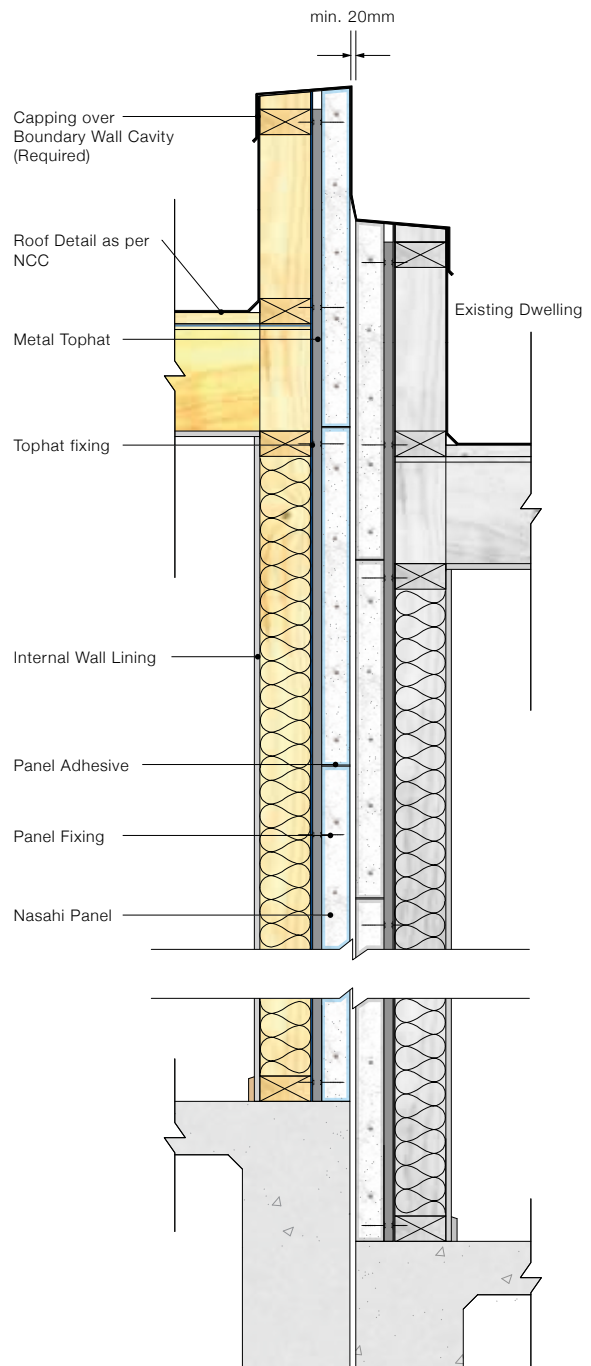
Boundary Wall Detail (Uneven Slab)
